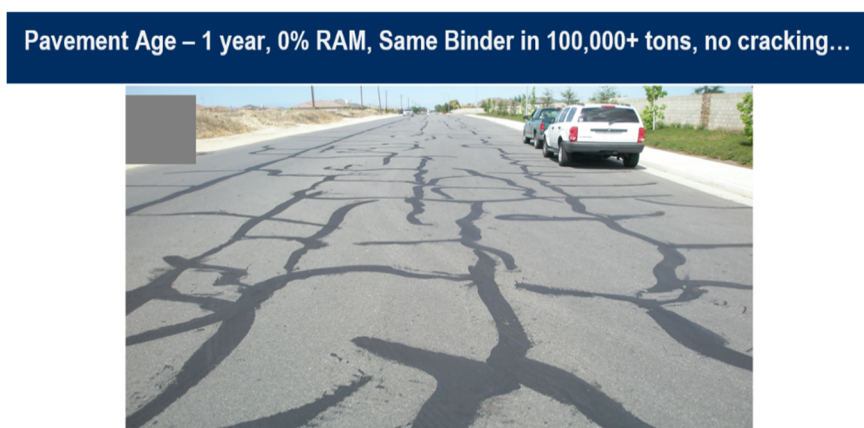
Significant block cracking in 1-year-old new asphalt pavement.
